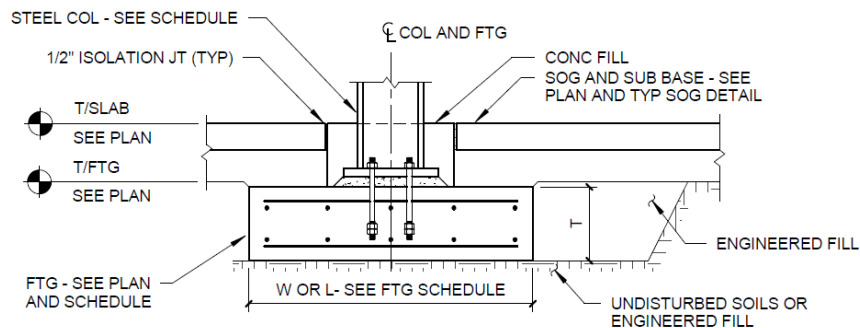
Typical Column Footing without Pier (Sheet S-3.01, Detail 2)
